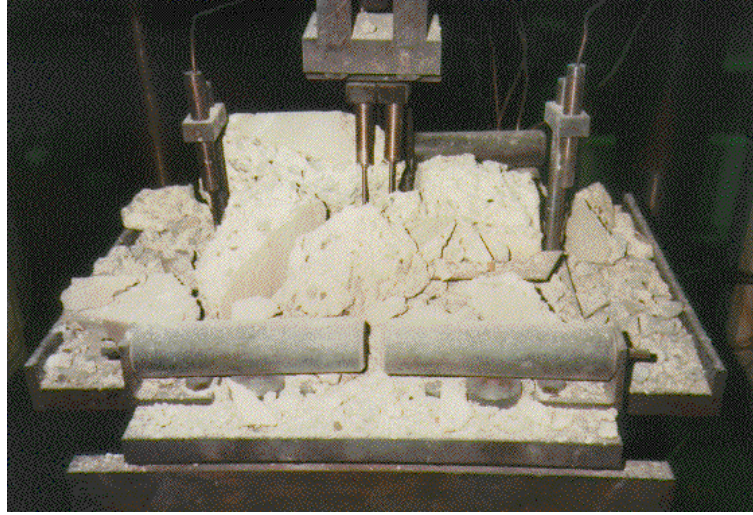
Spalling of the concrete beams on the testing block for 3°C/min
